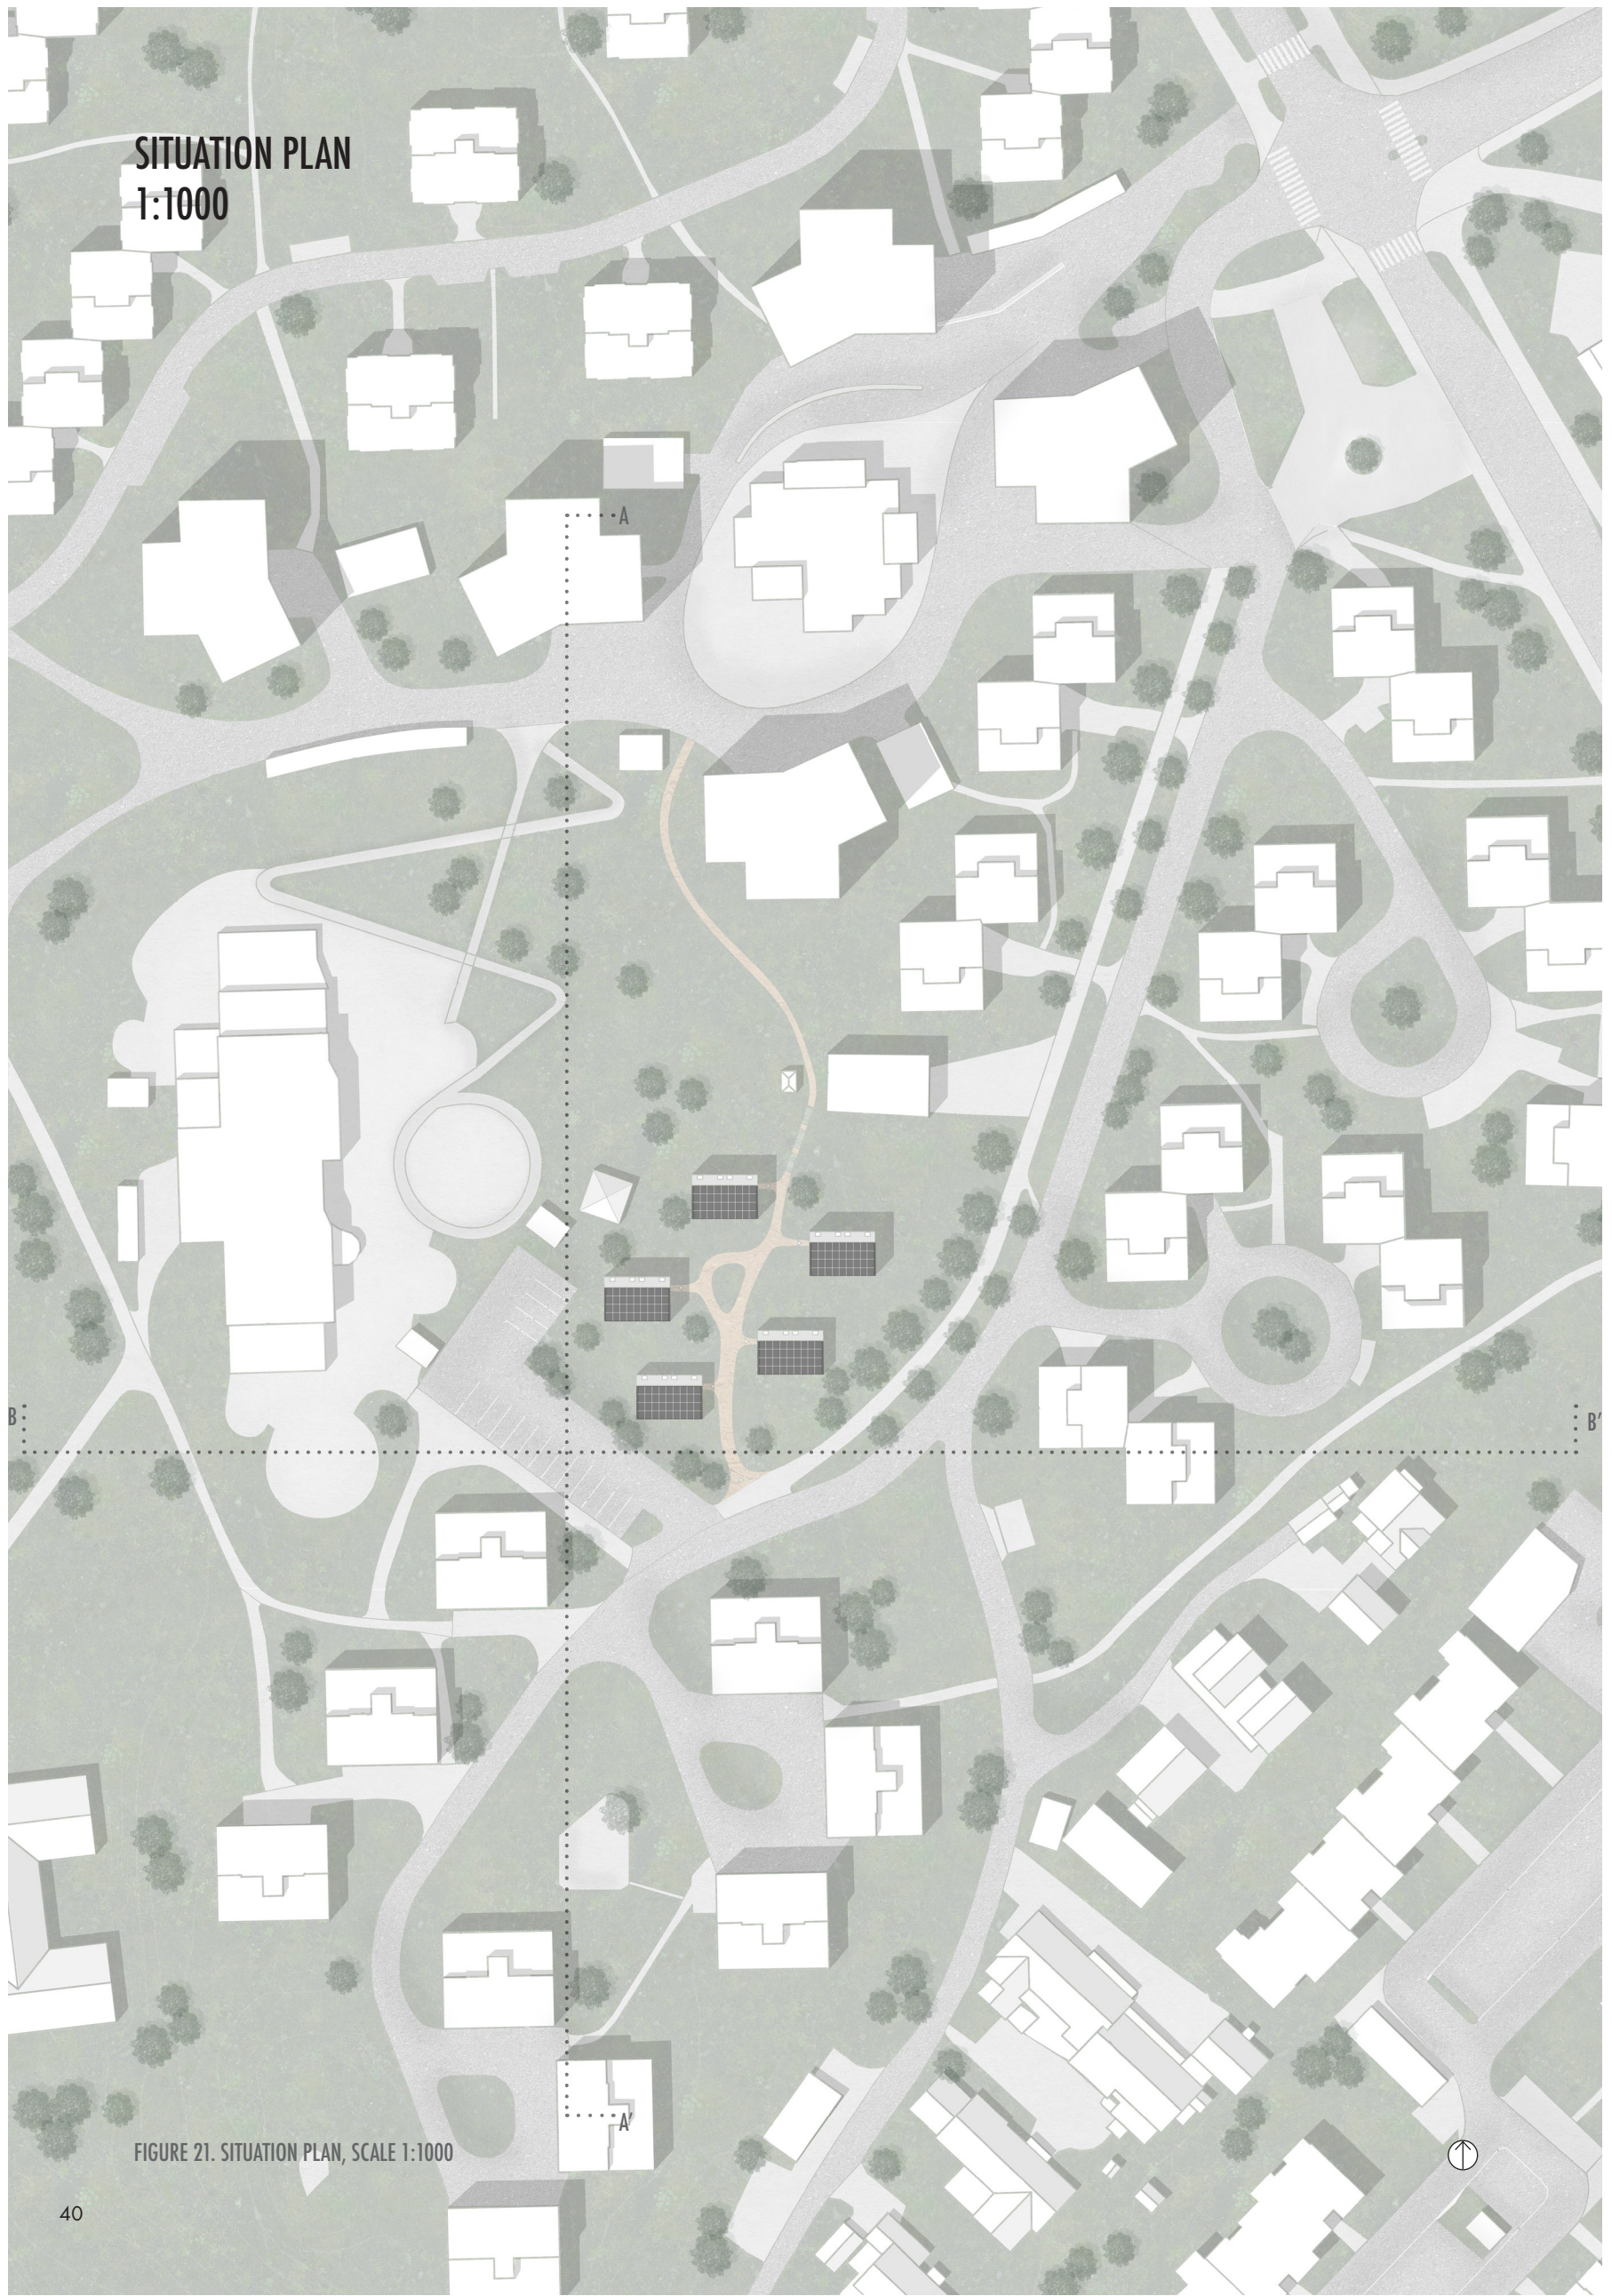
SITUATION PLAN, SCALE 1:1000
